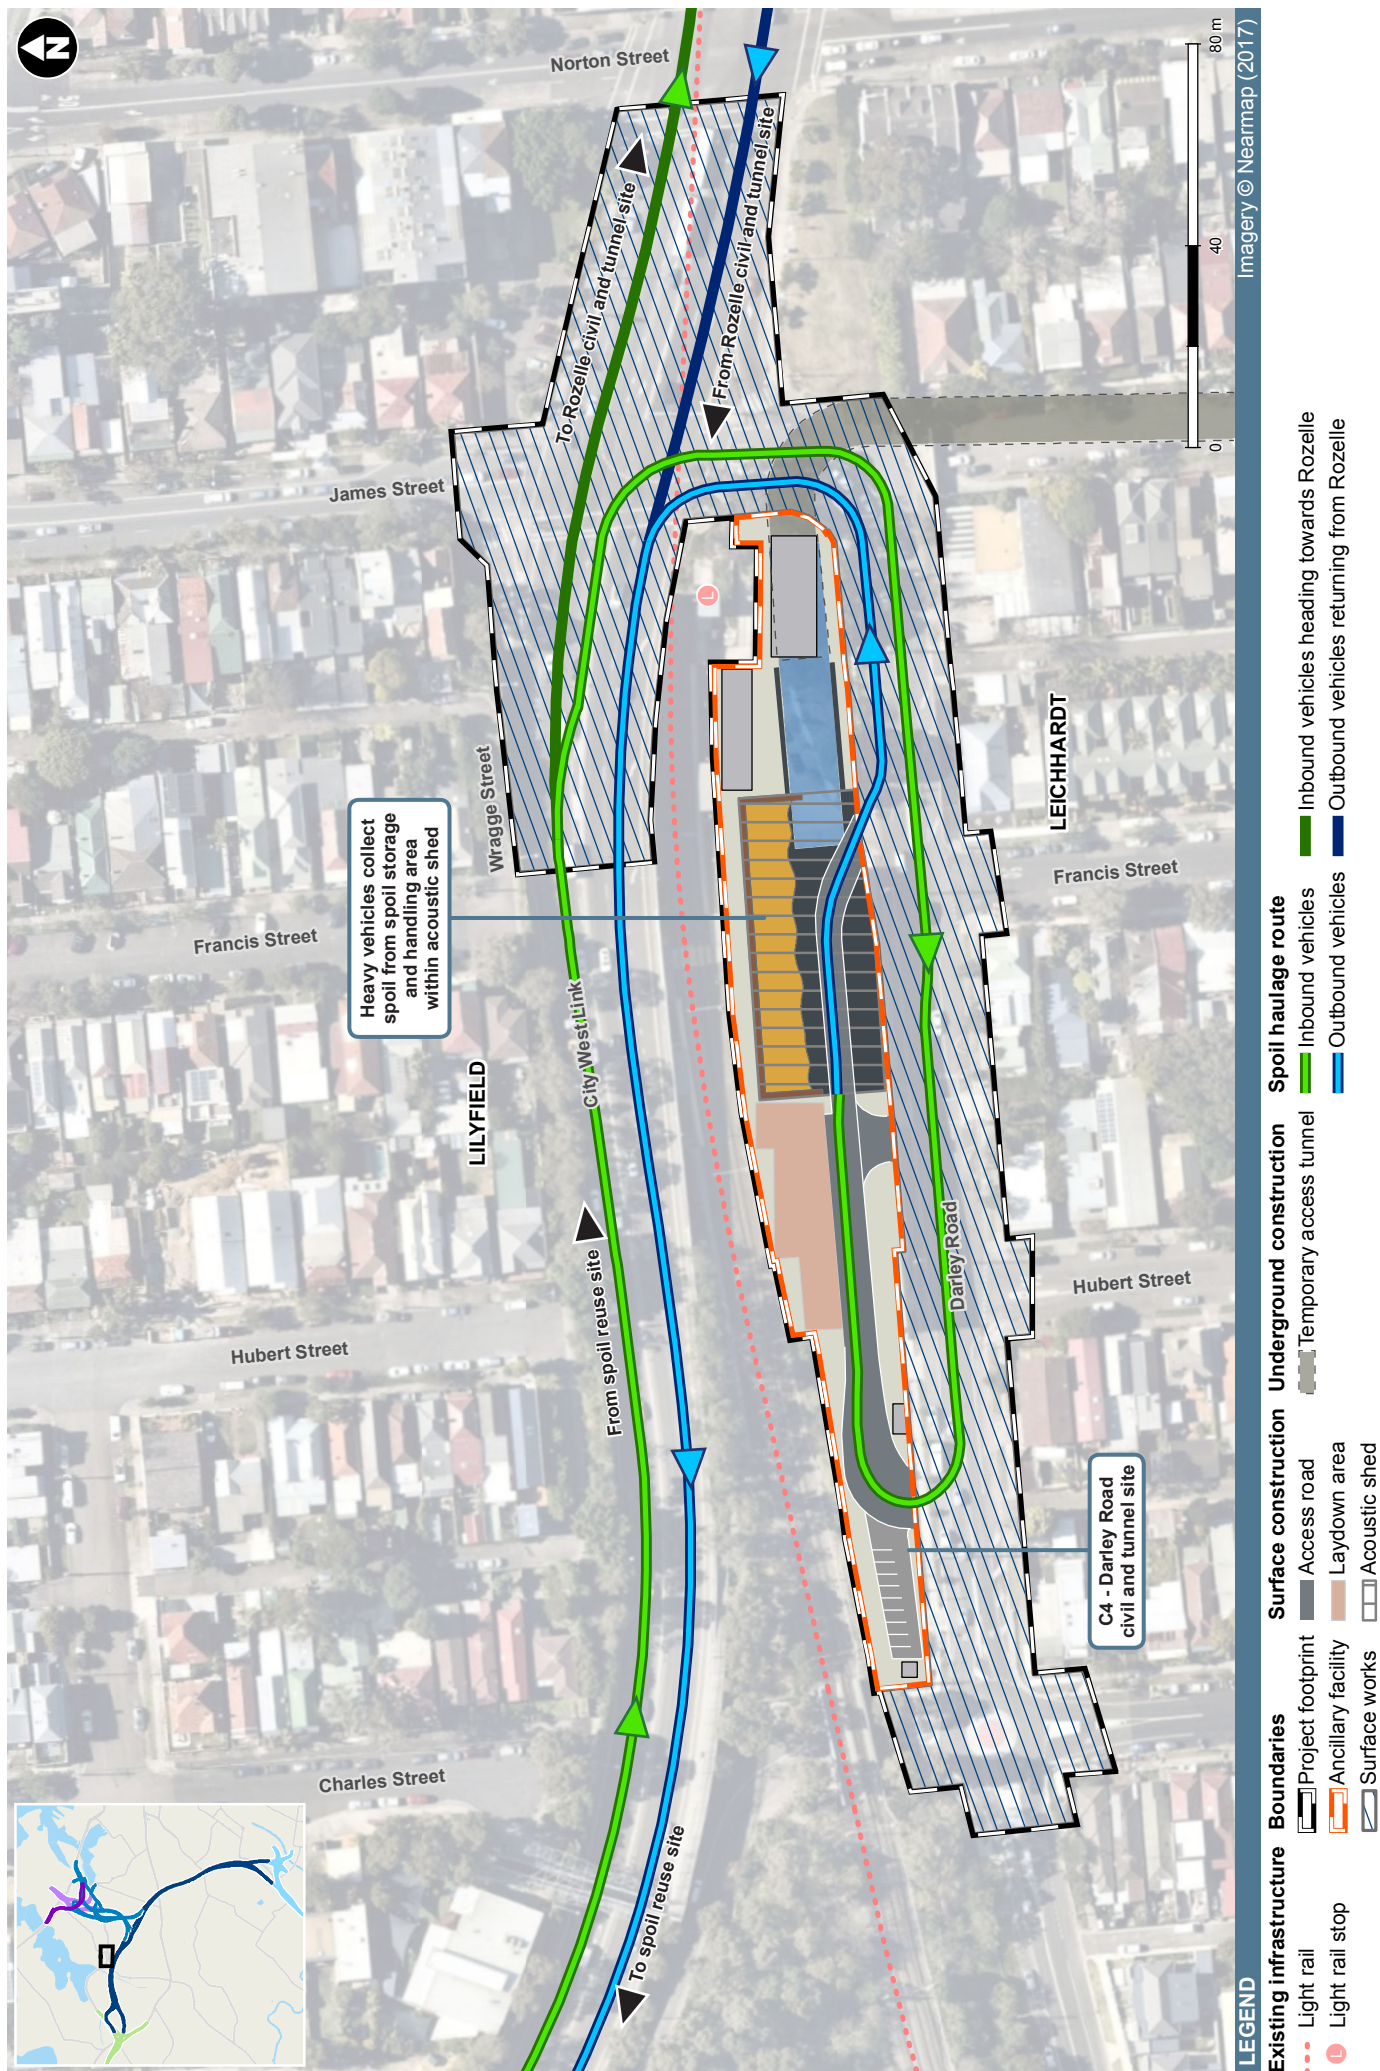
Indicative spoil haulage route – Darley Road civil and tunnel site (C4)
